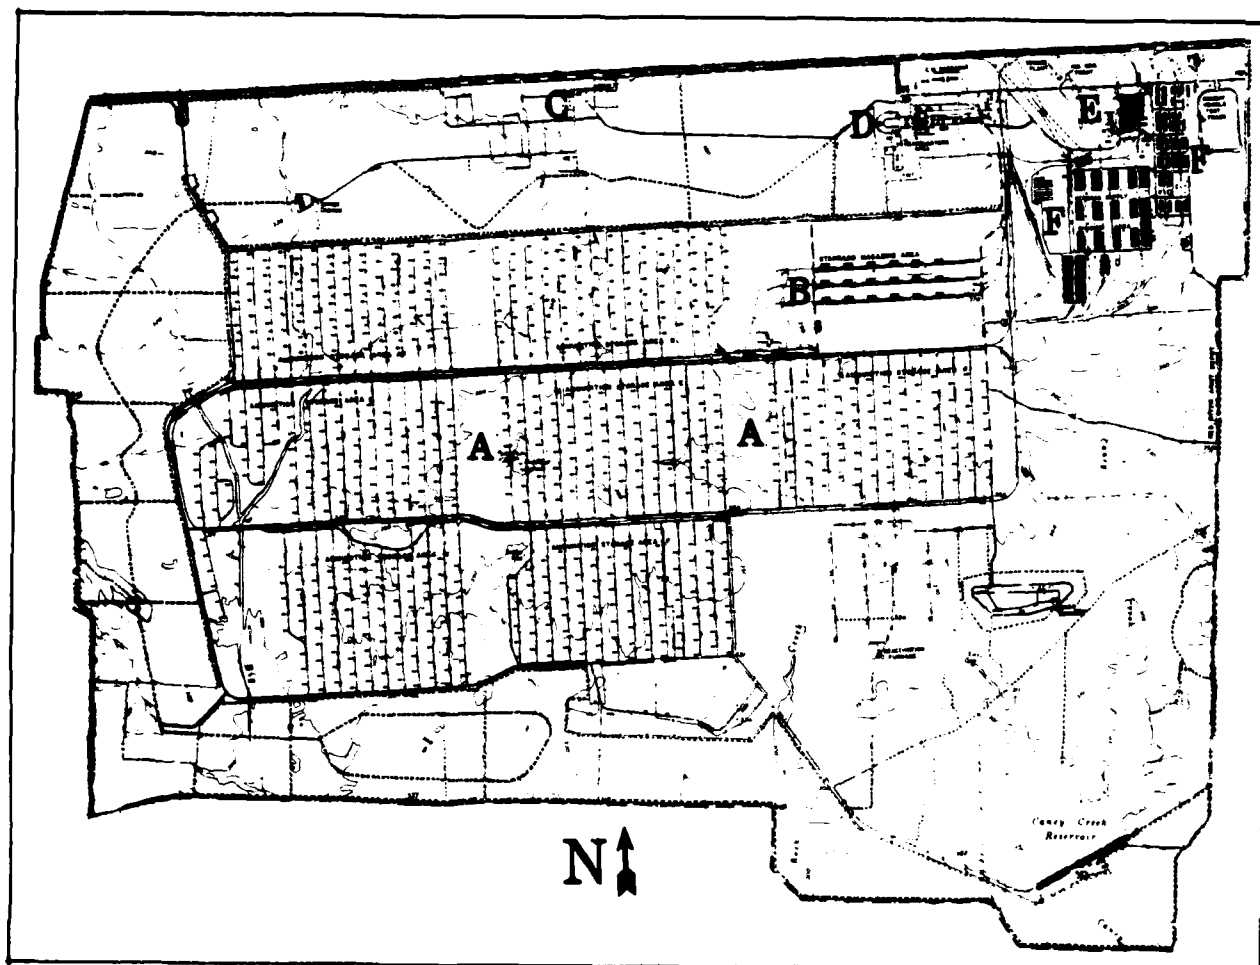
General site plan of Red River Army Depot. (Source: Unpublished drawing, n.d., RRAD Facilities Engineer's Office.)
